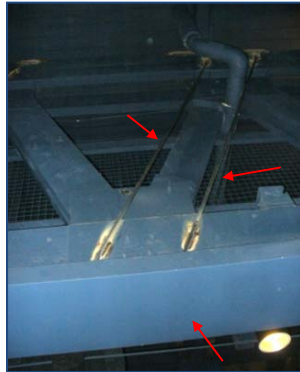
Remedial work in strengthening truss top chord connections.
